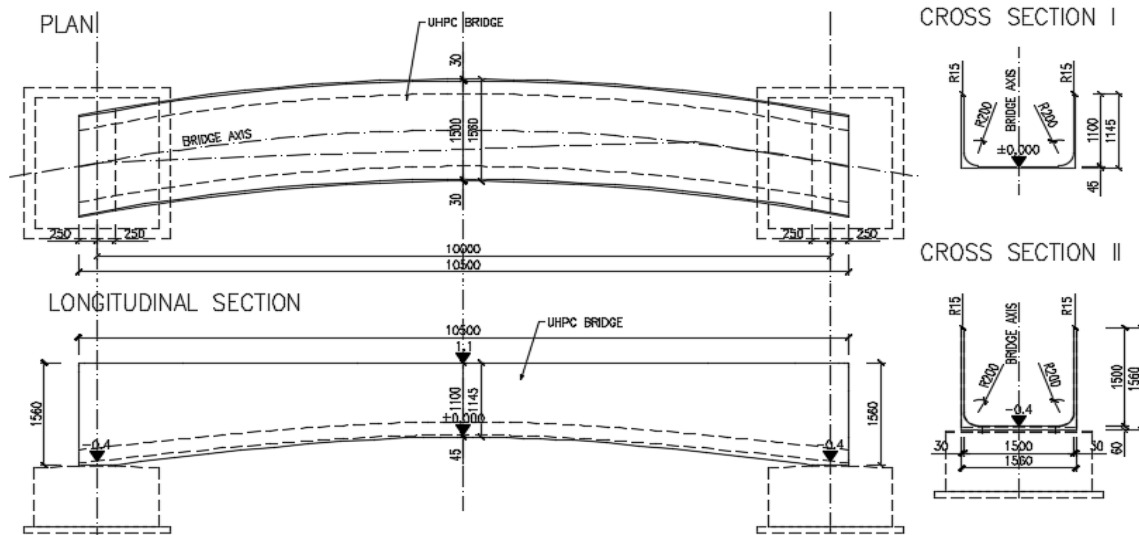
Plan, longitudinal and cross section of the final footbridge
